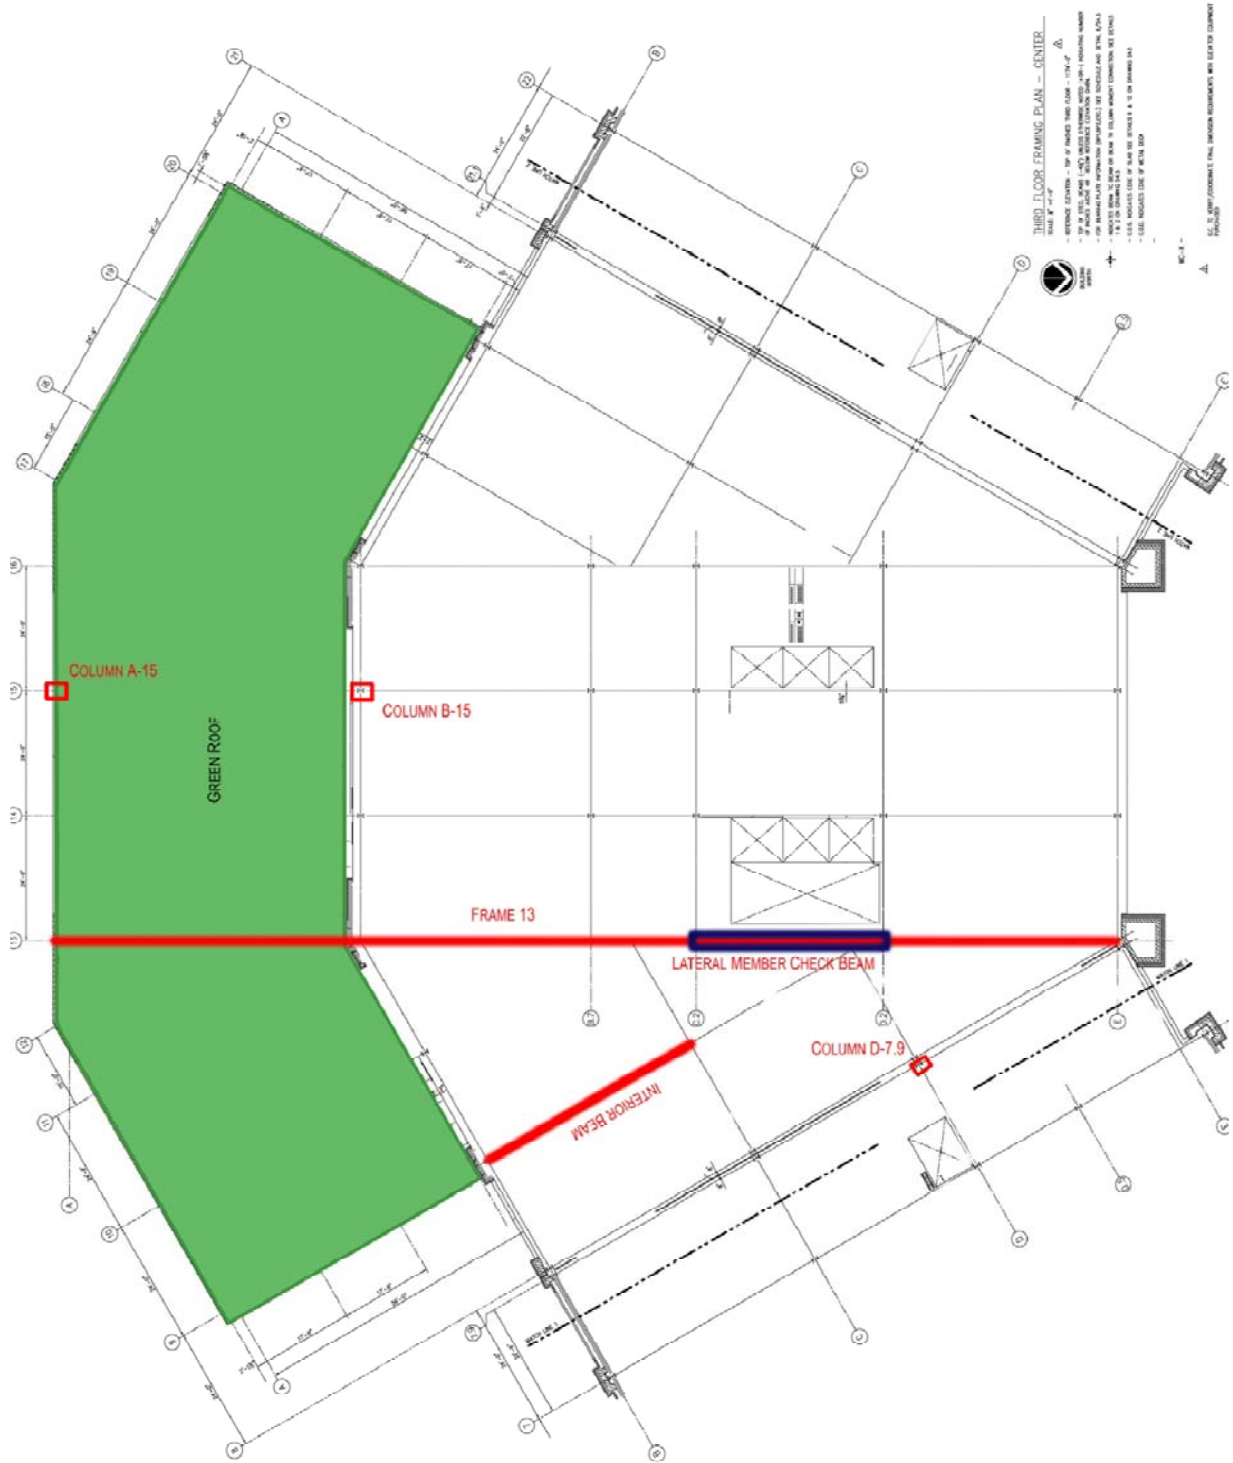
Third Floor Center of Redesigned Concrete Building with Portal Analysis Frame Indicated and Columns for Column Checks Indicated
